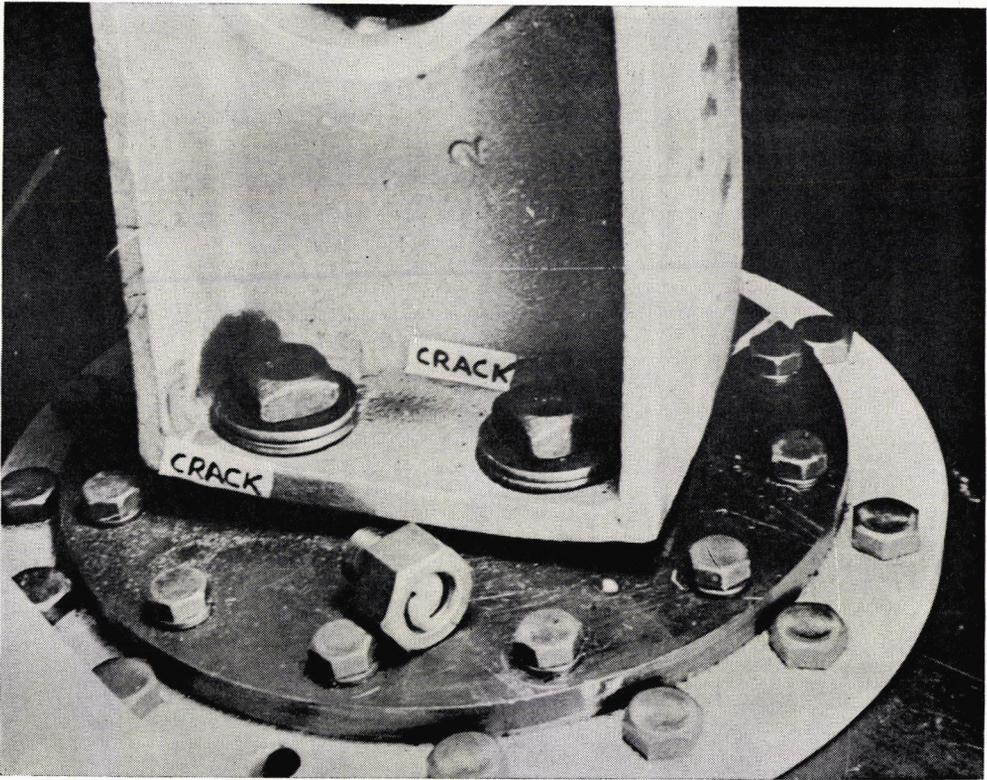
Static failure of front bolt at 22,000-lb load, regular Grade B steel post.
